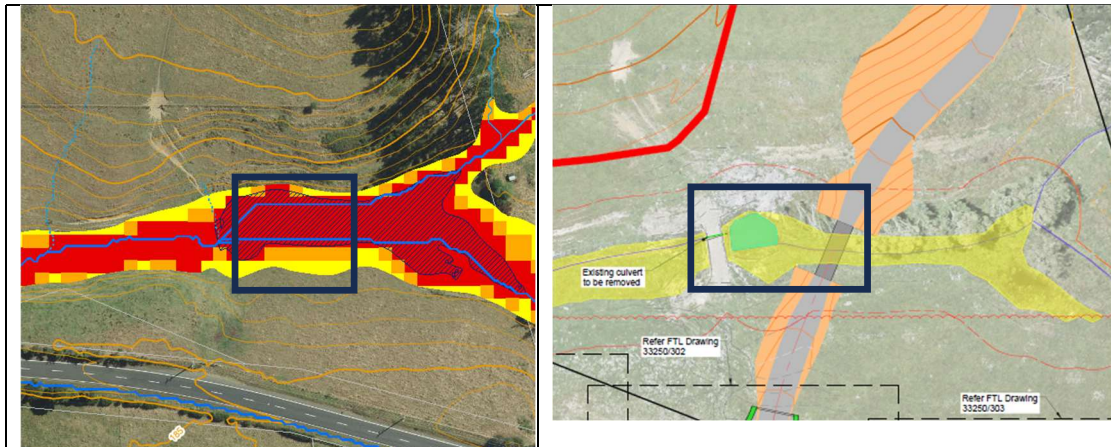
Box indicates location of culvert removal works and proposed bridge installation
